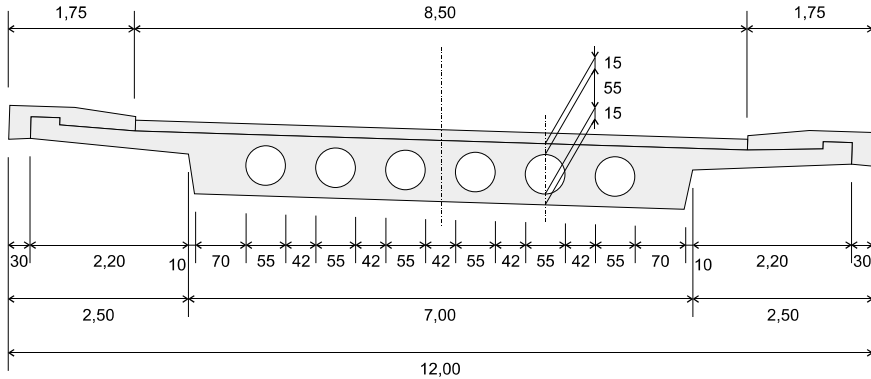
Bridge's cross-section (dimensions in centimetre)
